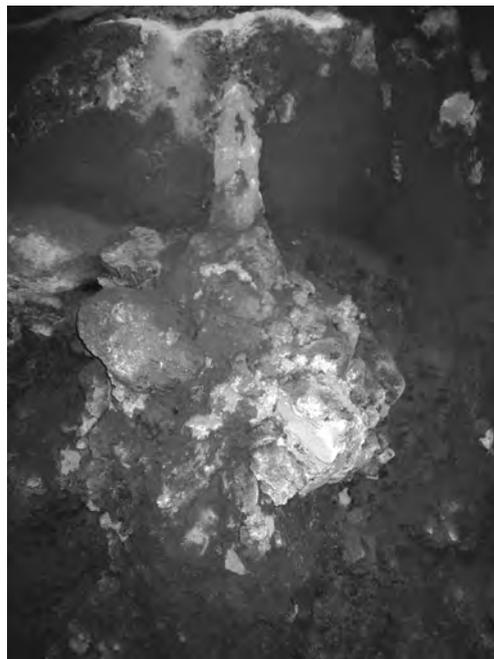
Confined grout column (at top centre) with a bulbous migration of grout into the soil/rock matrix lower half of photo (grout clearly distinguishable as light grey)
